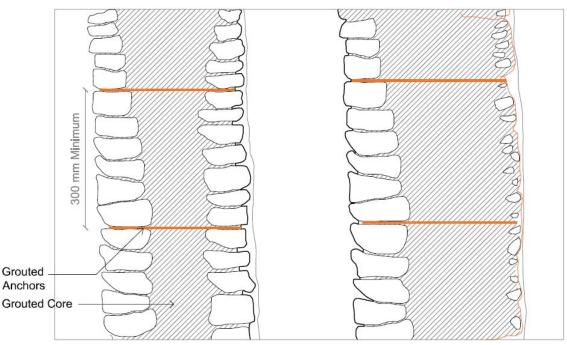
Illustration of grouted anchors (Chaudhry' 07)
